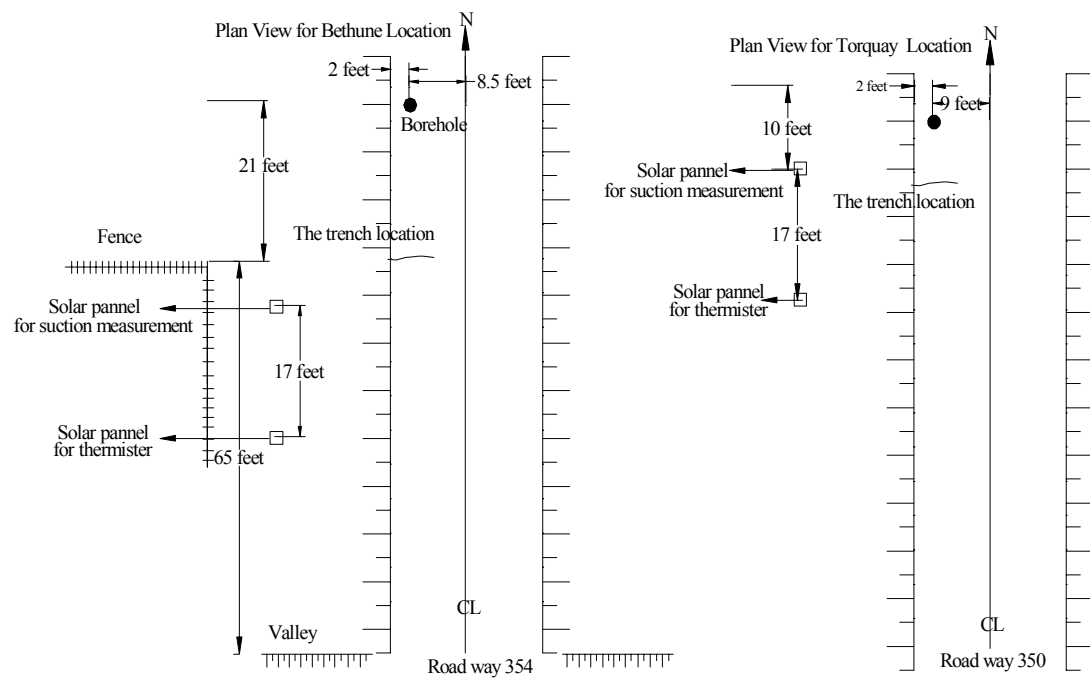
Plan for site investigation at the Bethune site and Torquay site
